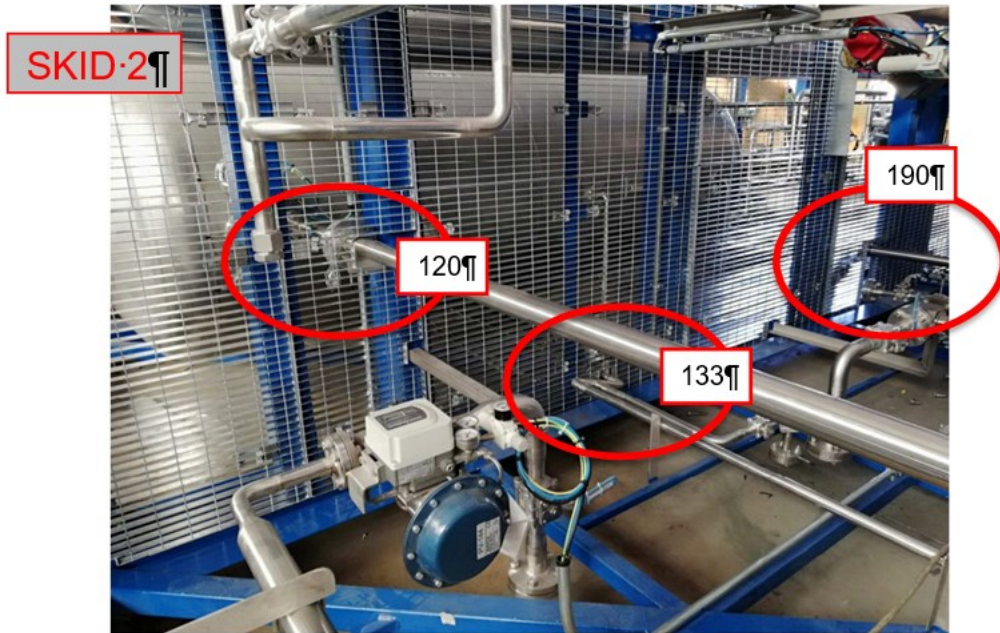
Blind flanges of skid 2 to be removed before the installation of skid 2 on skid 1.
